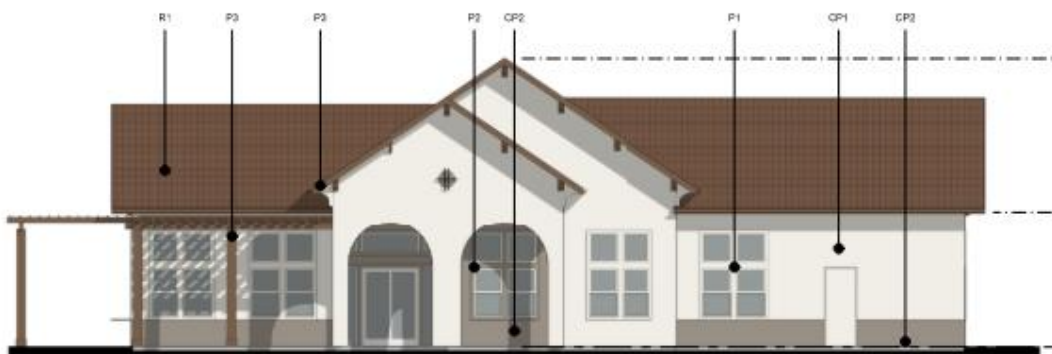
BUILDING 'A' STREET FACING ELEVATION
